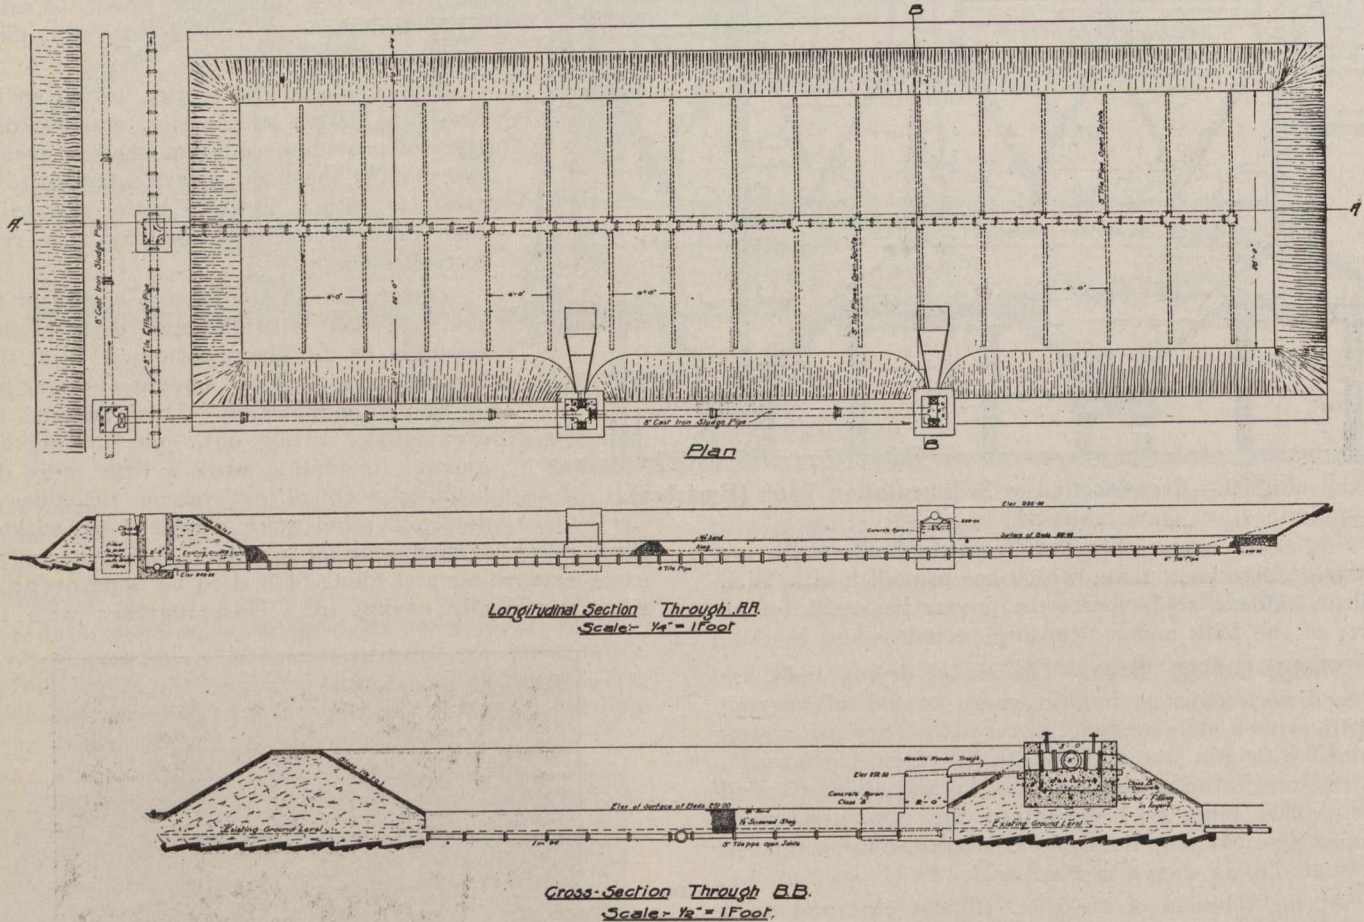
Plan and Sections of Sludge-drying Beds.
